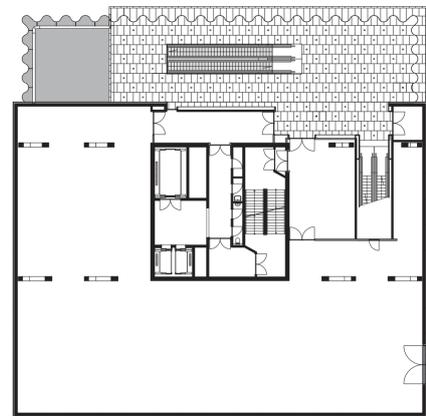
floor plan of museum aan de stroom, neutelings riedijk architecten
